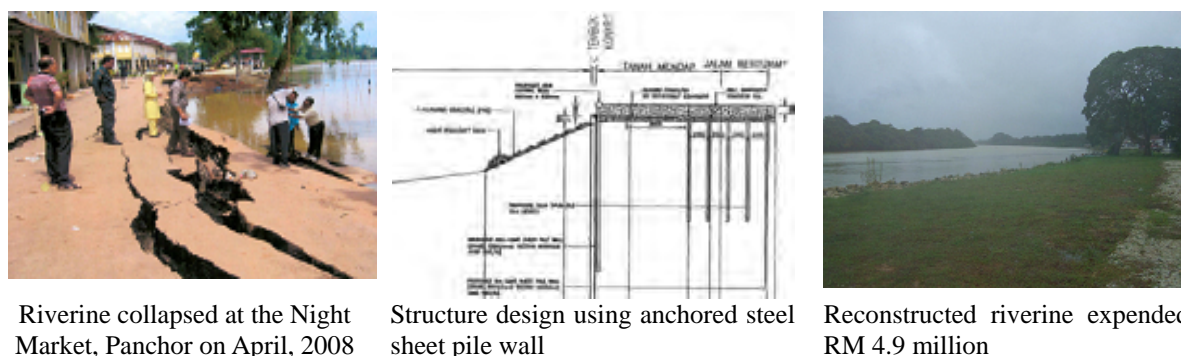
Bank Protection Work at Kg. Panchor
